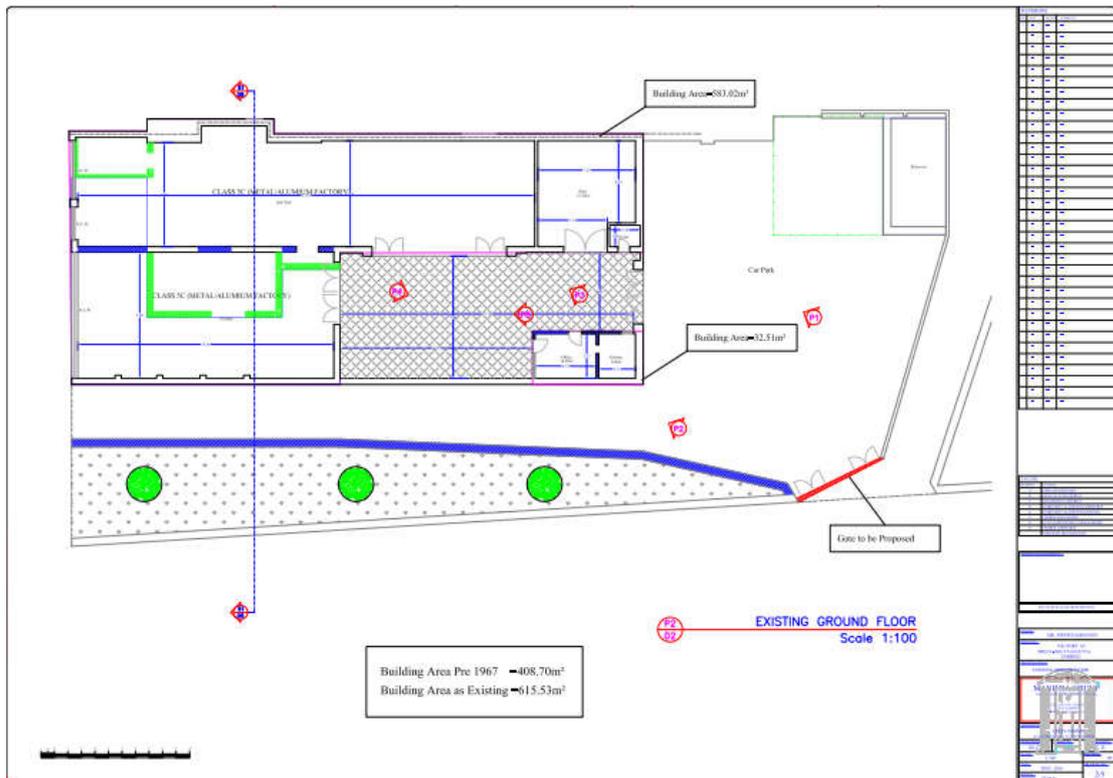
Existing/Proposed Block Plan (Source: Doc. PA03595/16/15c)
